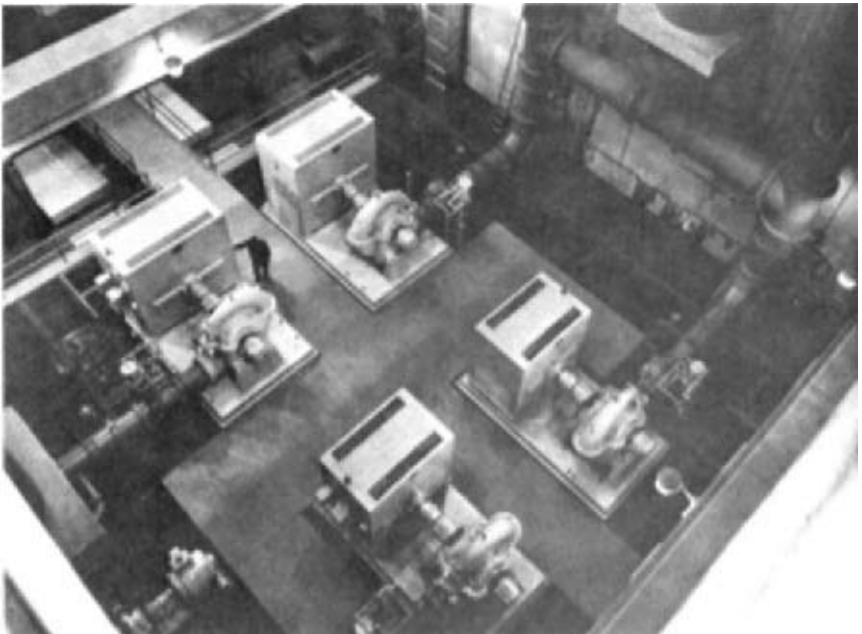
Dallas Iron Bridge 100-mgd ($3.78 \times 105 \text{ m}^3/\text{day}$) raw water pumping station, showing layout with bottom-suction, side-discharge pumping units (URS/Forrest and Cotton)
